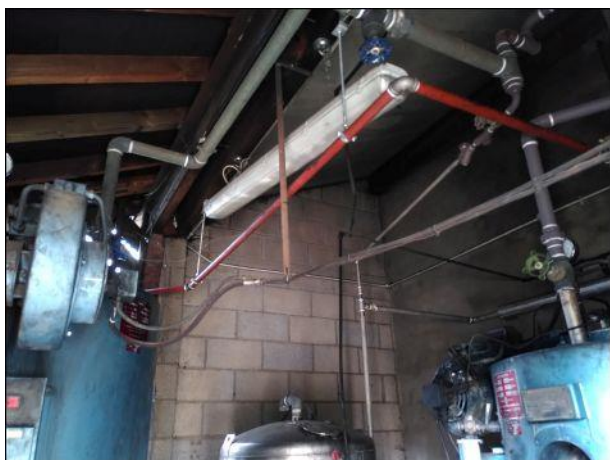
Plant within single-storey lean to extension at south-western end of Building 2
